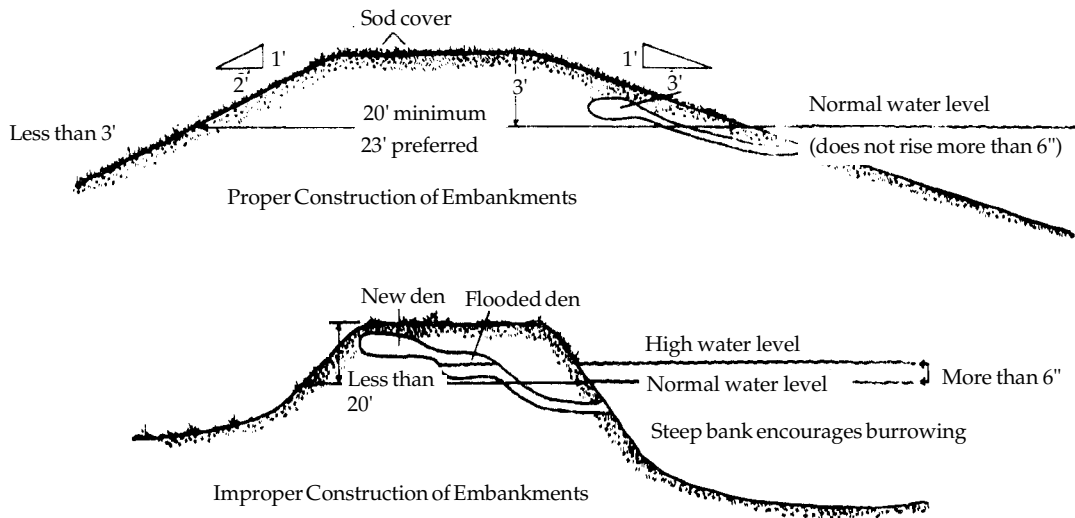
Proper dam construction can reduce muskrat damage to the structure.
